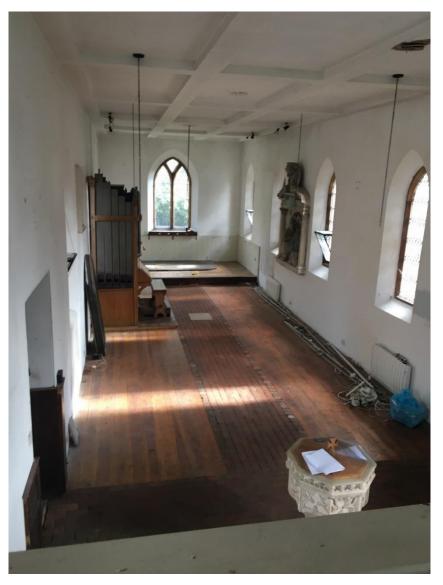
The open plan nave, with brick and timber flooring, raised platform at the west end and font at the east end
